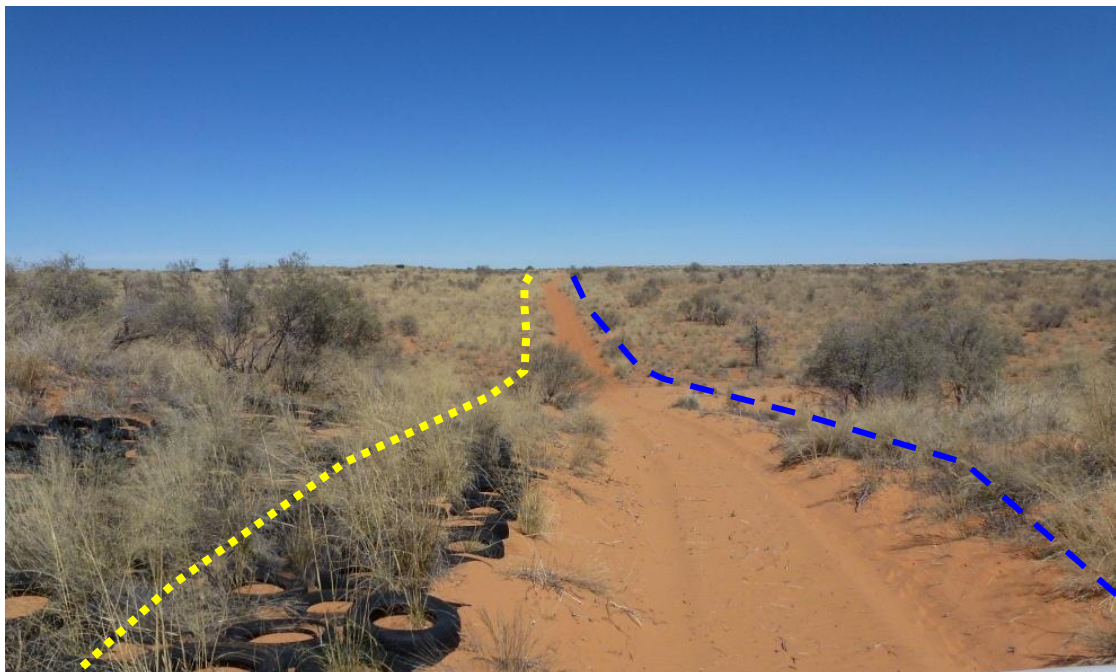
Typical view along the existing inspection track along the existing pipeline (servitude)
